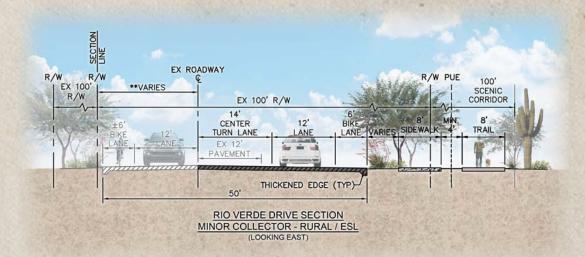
RIO VERDE DRIVE CROSS SECTION
